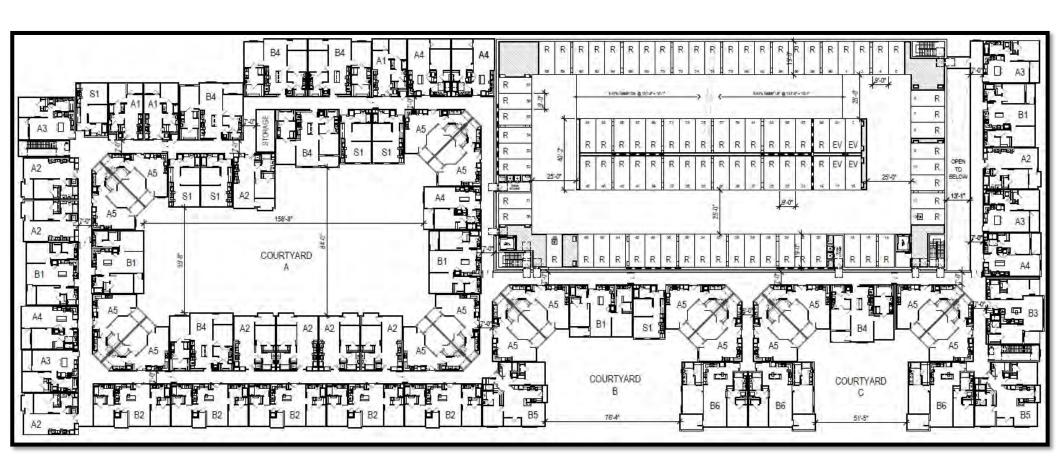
(4): Building Composite Plan – Level 6/Roof Plan
